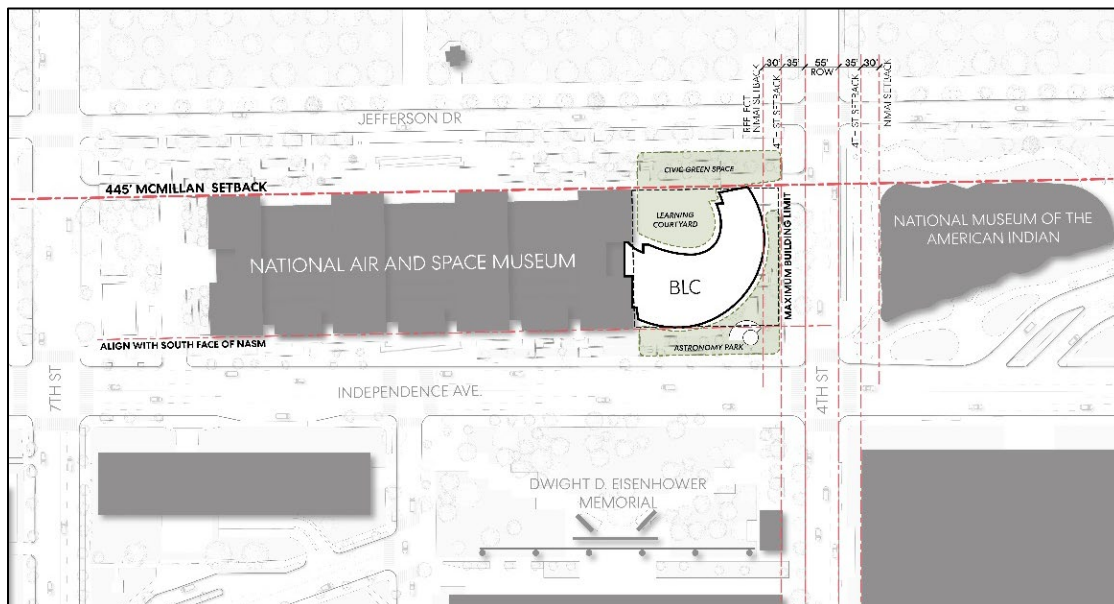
BLC setbacks from L'Enfant Plan streets, protecting viewsheds. (Perkins&Will, 2023)
